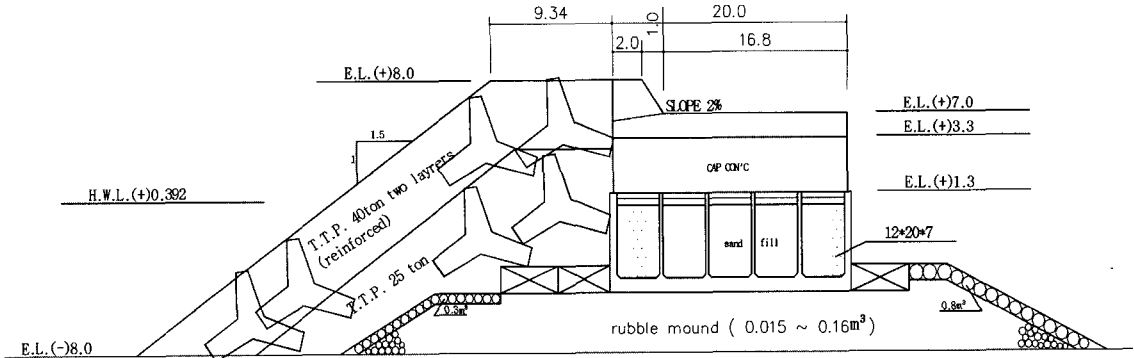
Cross-section of Section 7 after reinforcement. (unit: m)
